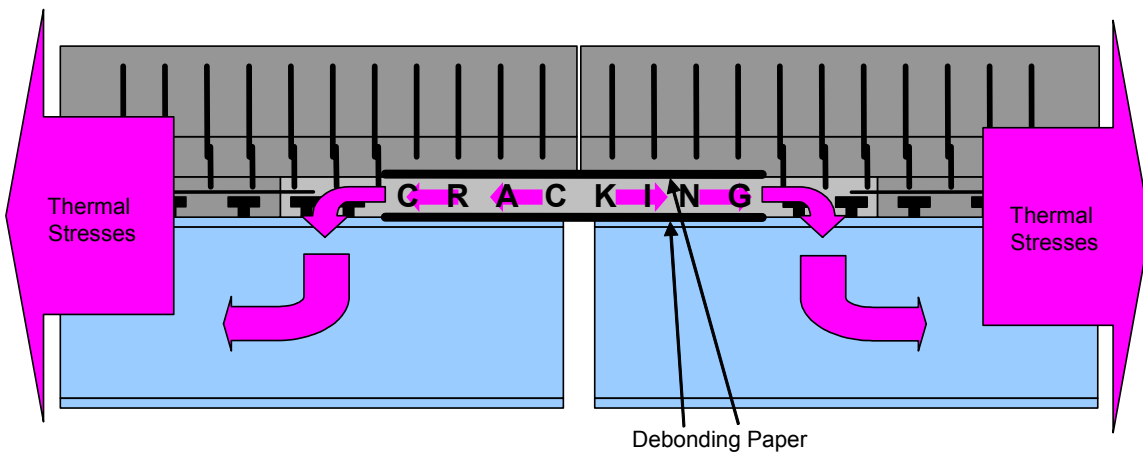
ECC link slab with debonded concrete sidewalk and barrier wall.
